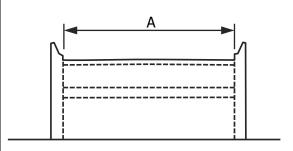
Cross-section view of a filled arch bridge or culvert under fill with headwalls.
